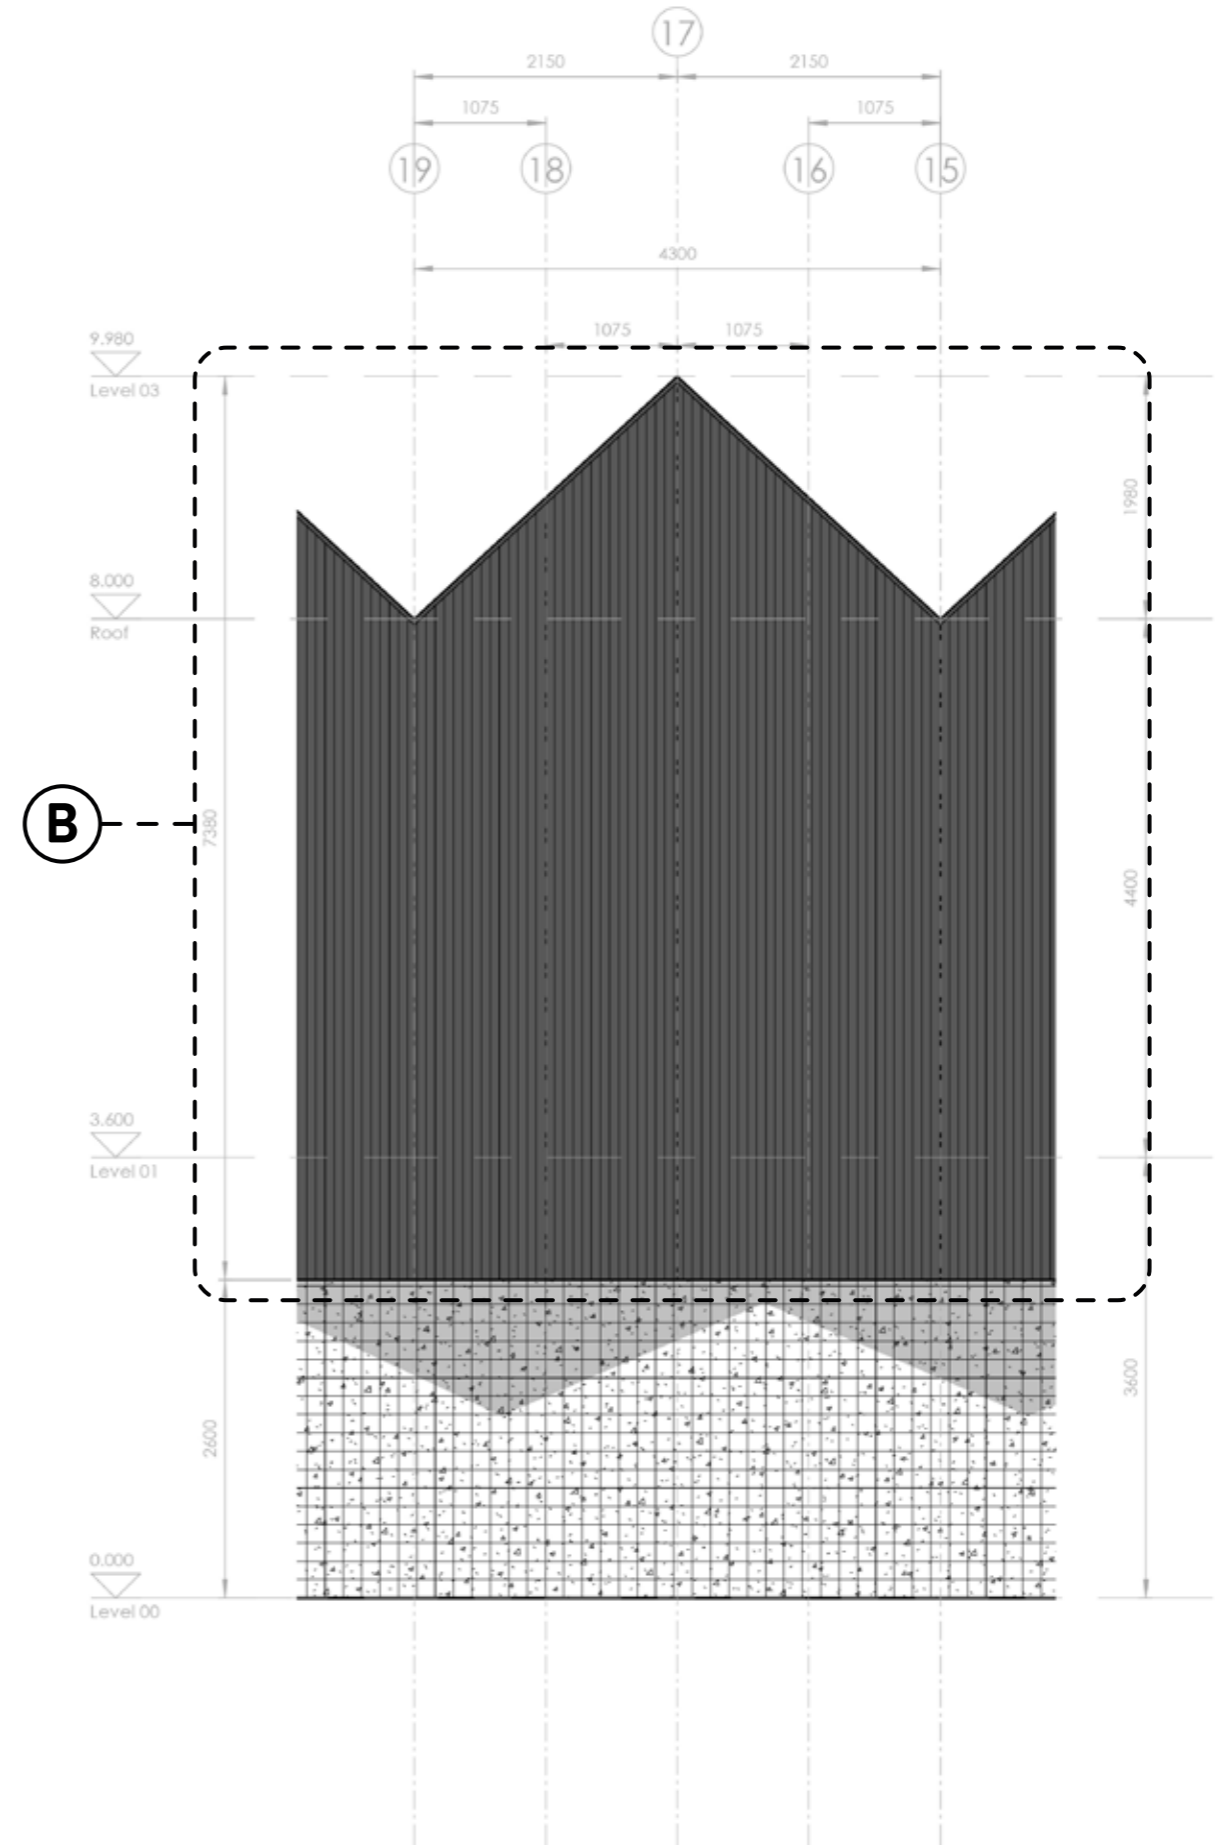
(above): Extract from drawing 3846-FBA-00-XX-DR-A-01\_60
